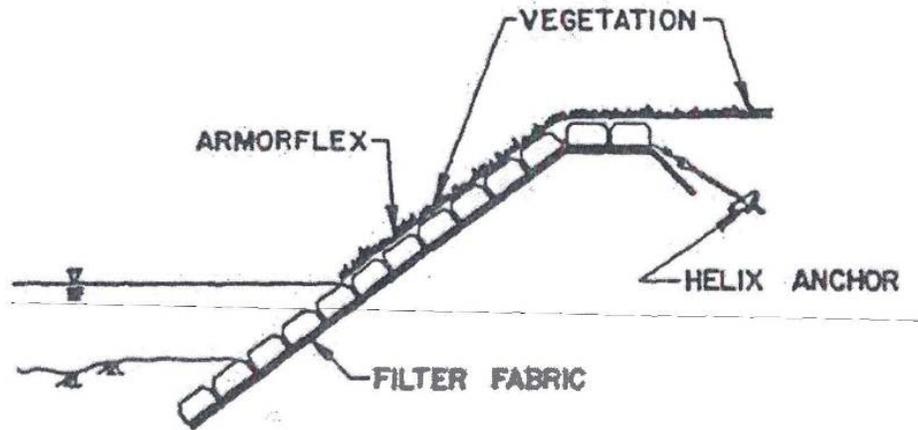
Articulated Concrete Block (Closed or Open Cell)
